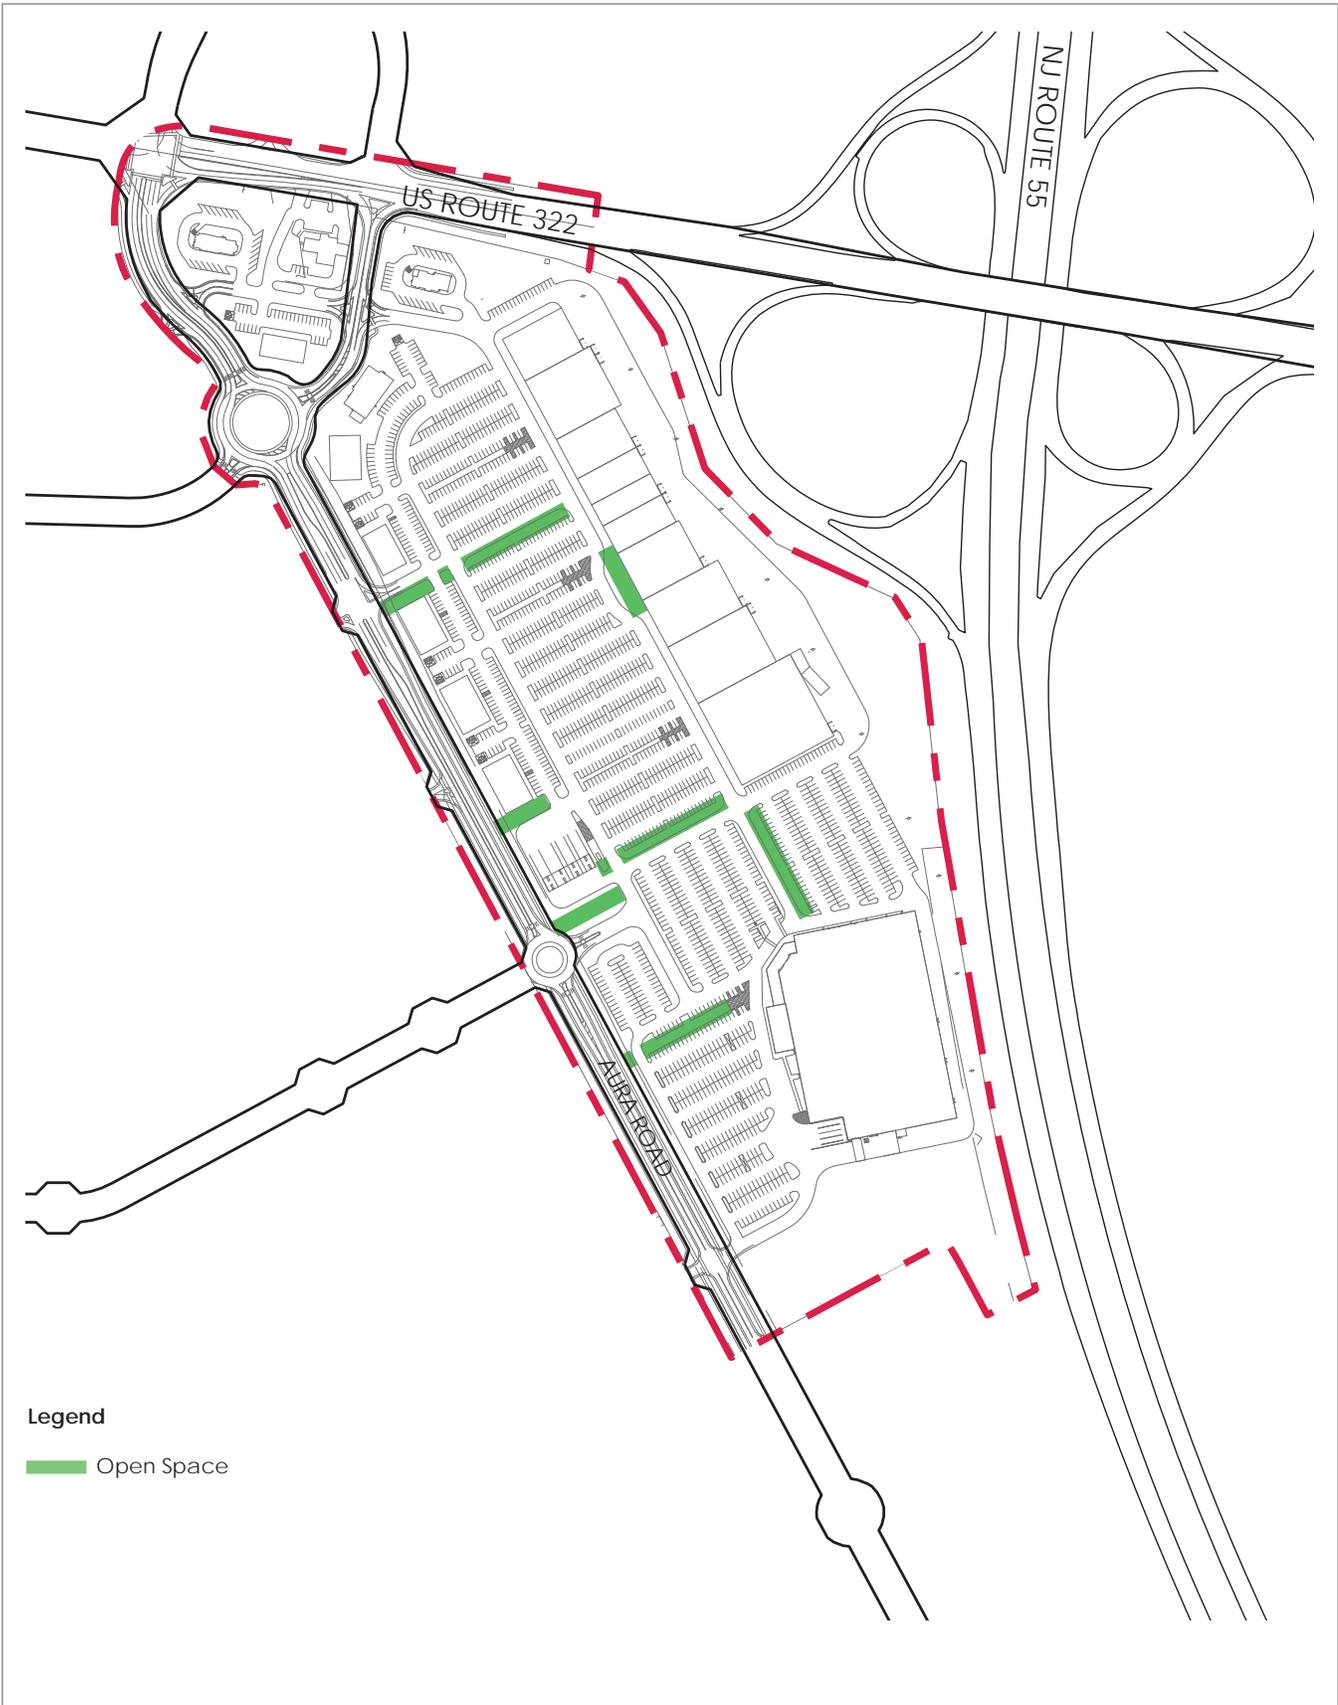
Southside Redevelopment Plan Open Space depicts open space elements within the Southside Commercial redevelopment Area (1.1 Acres) qualify toward the Open Space obligation of the Richwood Center. Off site obligations are found in 3.4: Public Infrastructure of this Plan. See Figure 48: Southside Redevelopment Plan Sidewalk Locations and Figure 49: Internal Sidewalk Typologies for design requirements.
